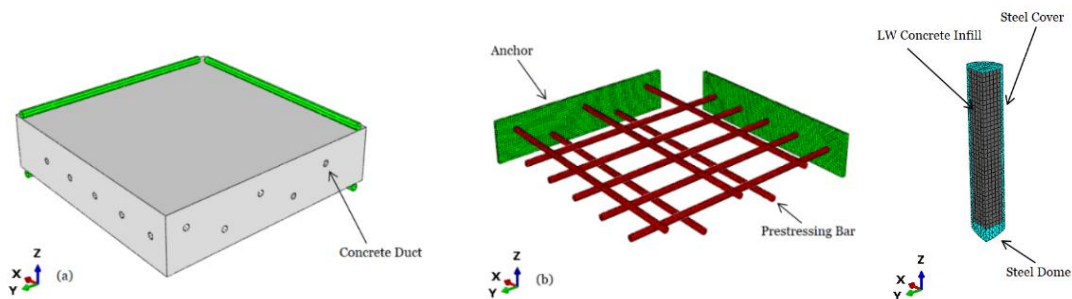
Prestressed concrete slab model (a), anchor and pre-stressing bar (b), missile model on far right.
